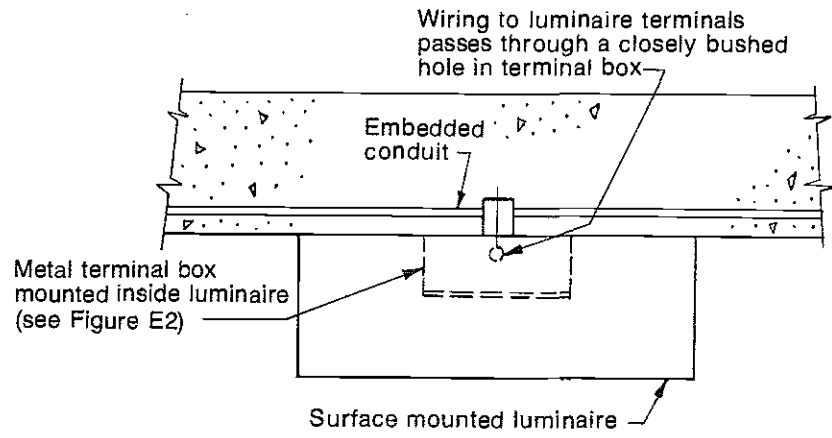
TYPICAL LAYOUT OF TERMINAL BOX MOUNTED INSIDE
